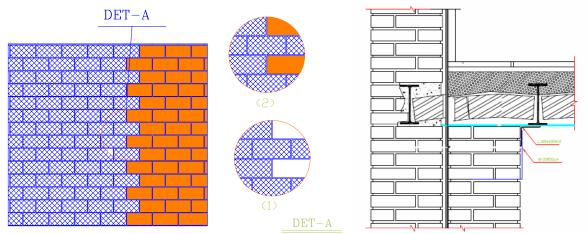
Wall addition for modification of opening edges with completer connection to the existing wall (left)and also the places where the wall thickness has not been enough (right)
